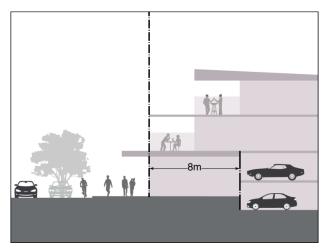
Permitted parking areas to ground floor level for commercial or mixed use development
